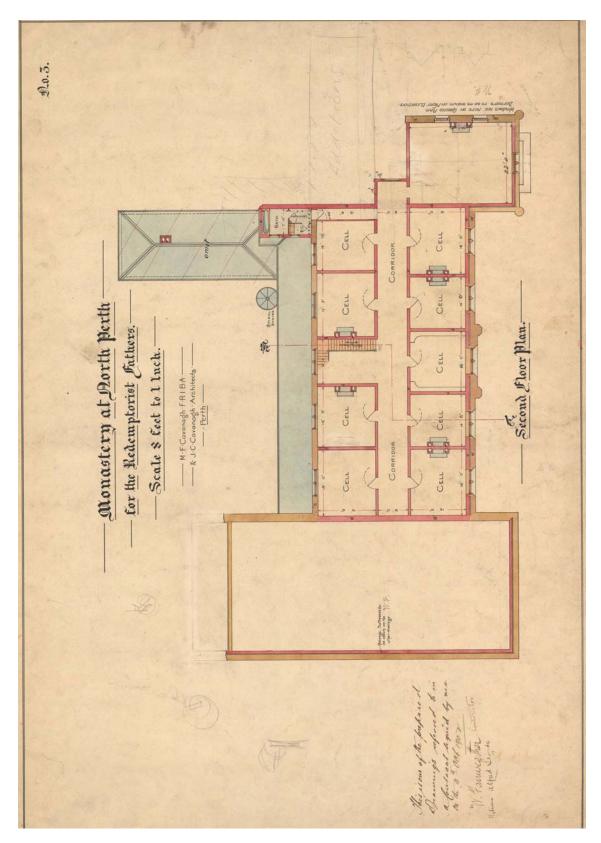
'Monastery at North Perth for the Redemptorist Fathers', Second Floor Plan, No.3, c.1903. The construction appears to have followed the plan accurately, except that an oratory was included at the west end of the corridor. Plan courtesy of the Redemptorist Fathers.
